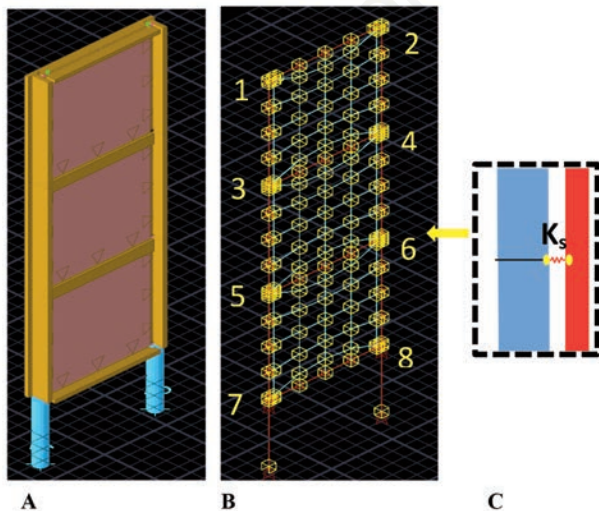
Finite element (FE) shear wall model: A) shear wall model; B) FE model; C) spring connection of  $K_s$  stiffness.
